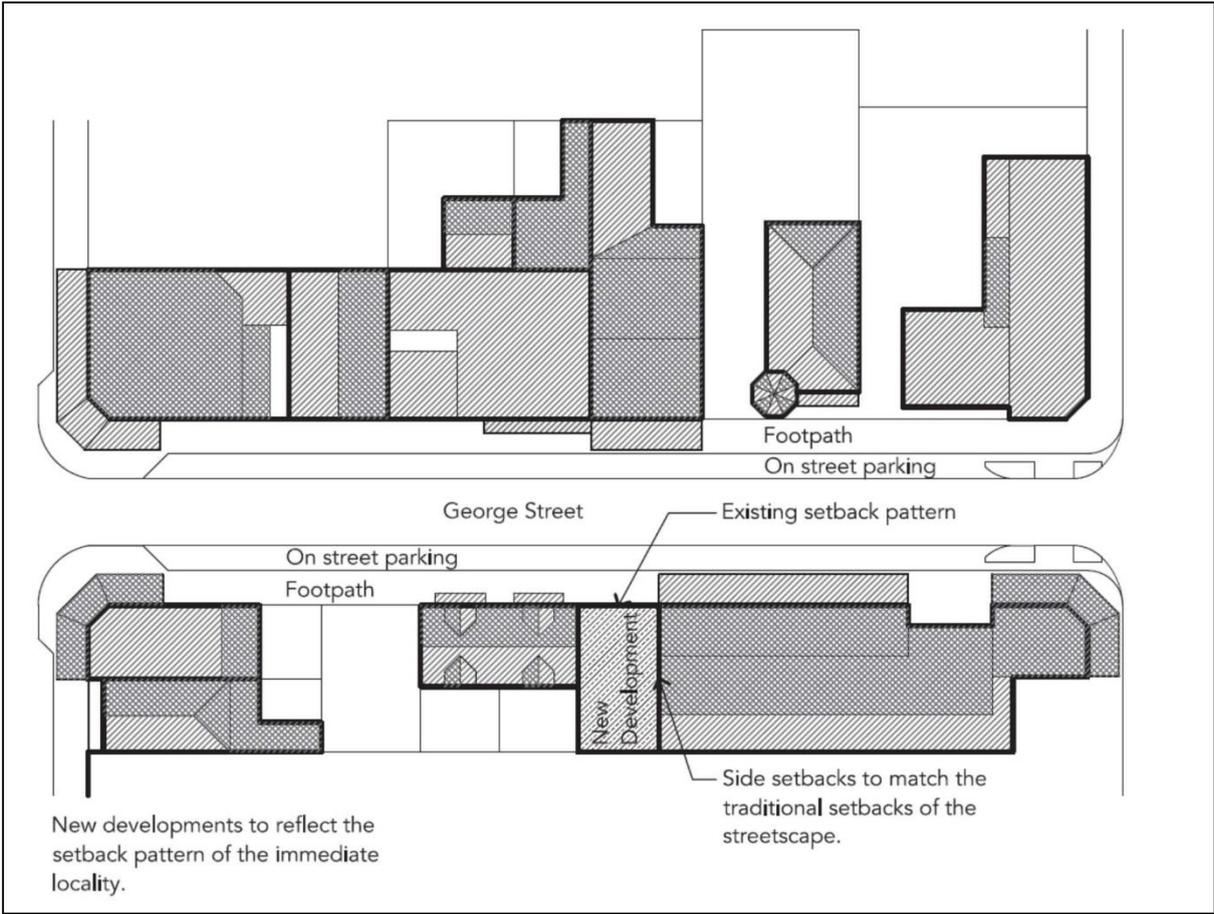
Site plan illustrating existing setback patterns and compatible new development.
